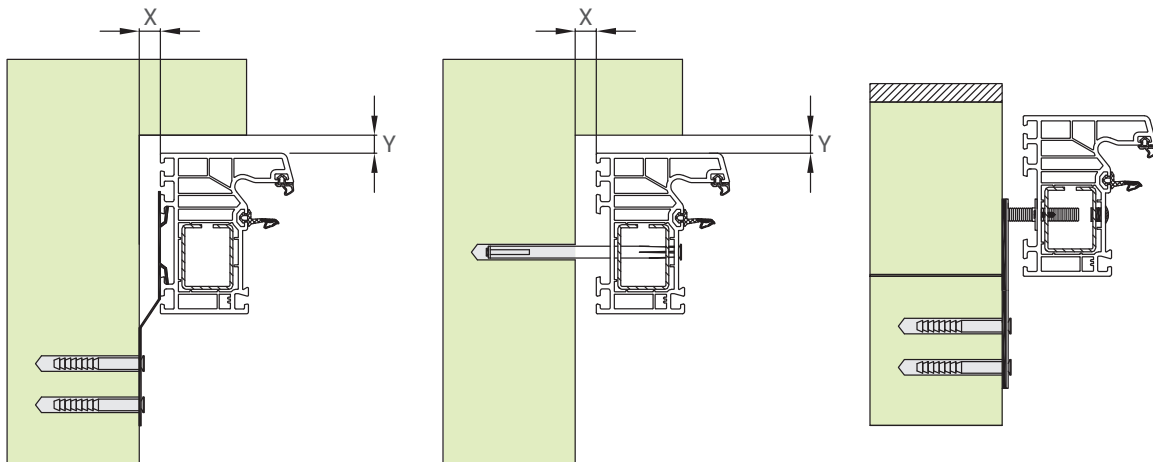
Layout of window frames in the internal reveal of walls as part of various construction:
